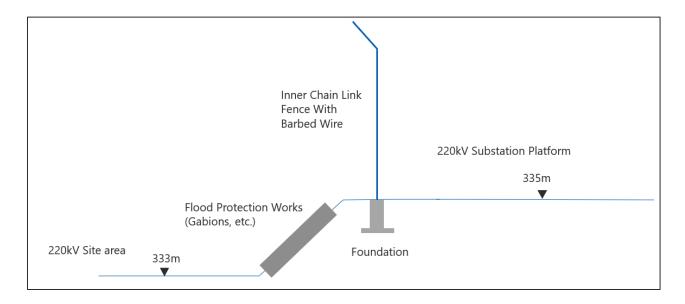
Substation platform cross-section (sketch not to scale)
